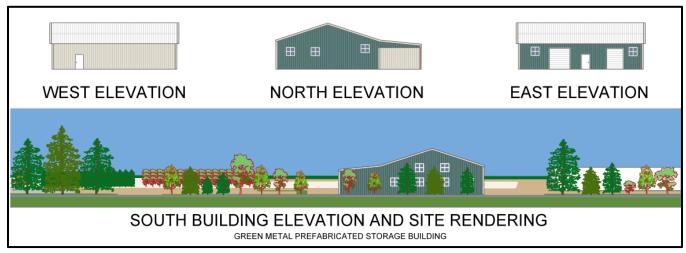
Pole Barn Elevations (Tool Storage Building and Existing Utility Building)
